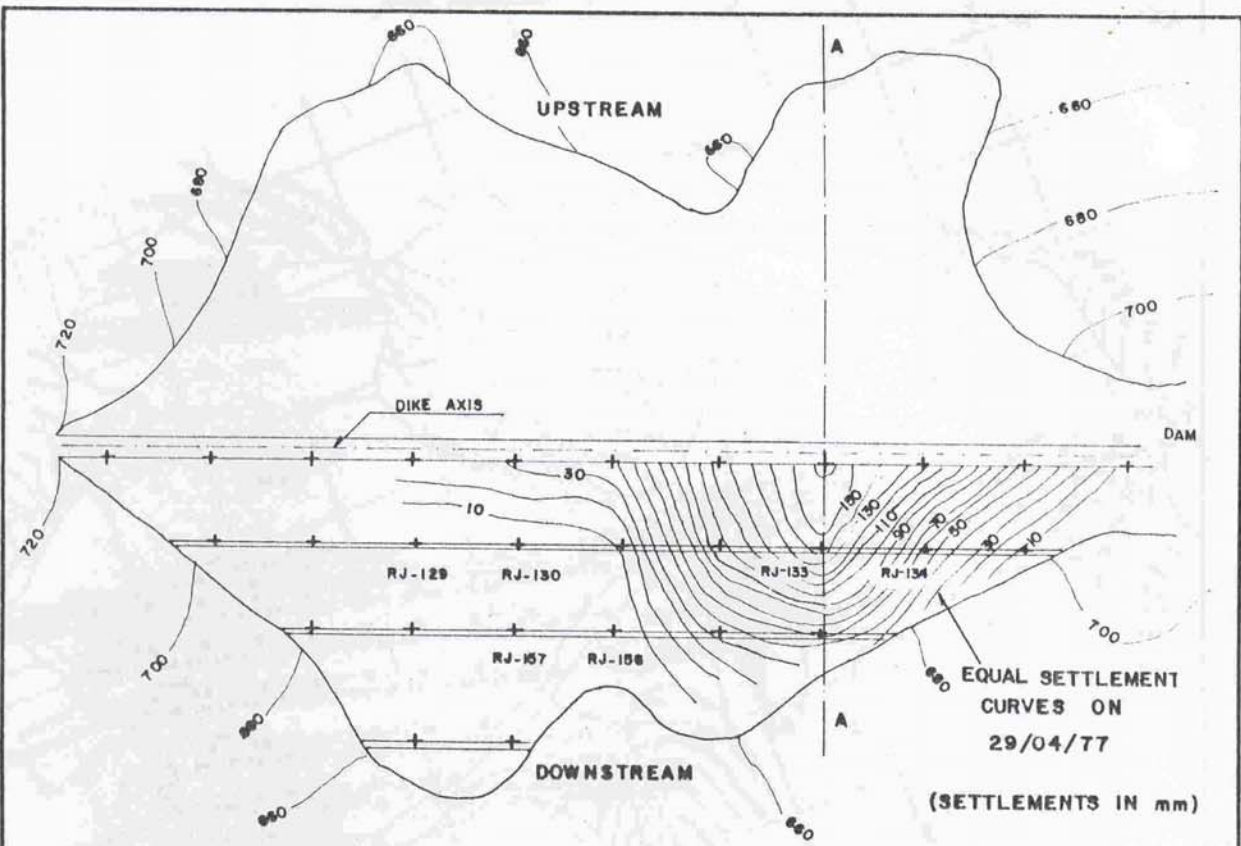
DETAILS ON FIG. 20 . COLLAPSE AND SURFACE SETTLEMENT DISH THAT CAUSED MINOR SURFACE CRACKING
